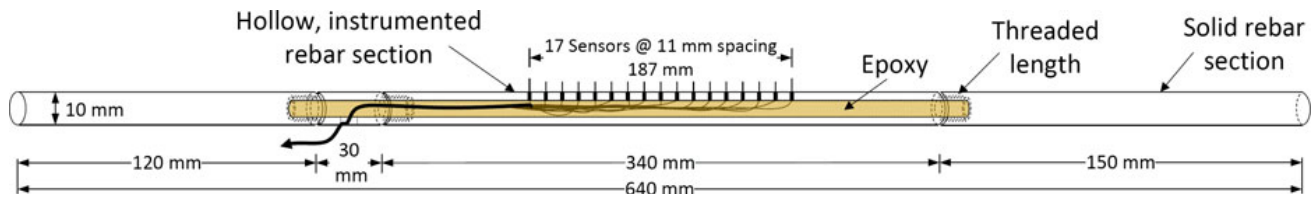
Schematic of the instrumented reinforcement used for corrosion investigations (*Note: Deformed reinforcement was used, ribs not shown in drawing*)
